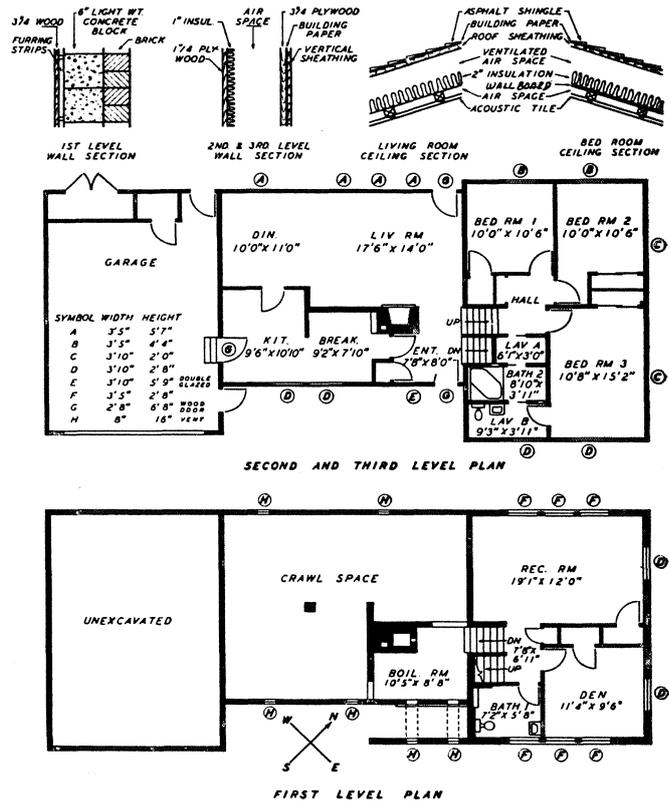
I-B-R Hydronic Research House floor plans and miscellaneous construction details
